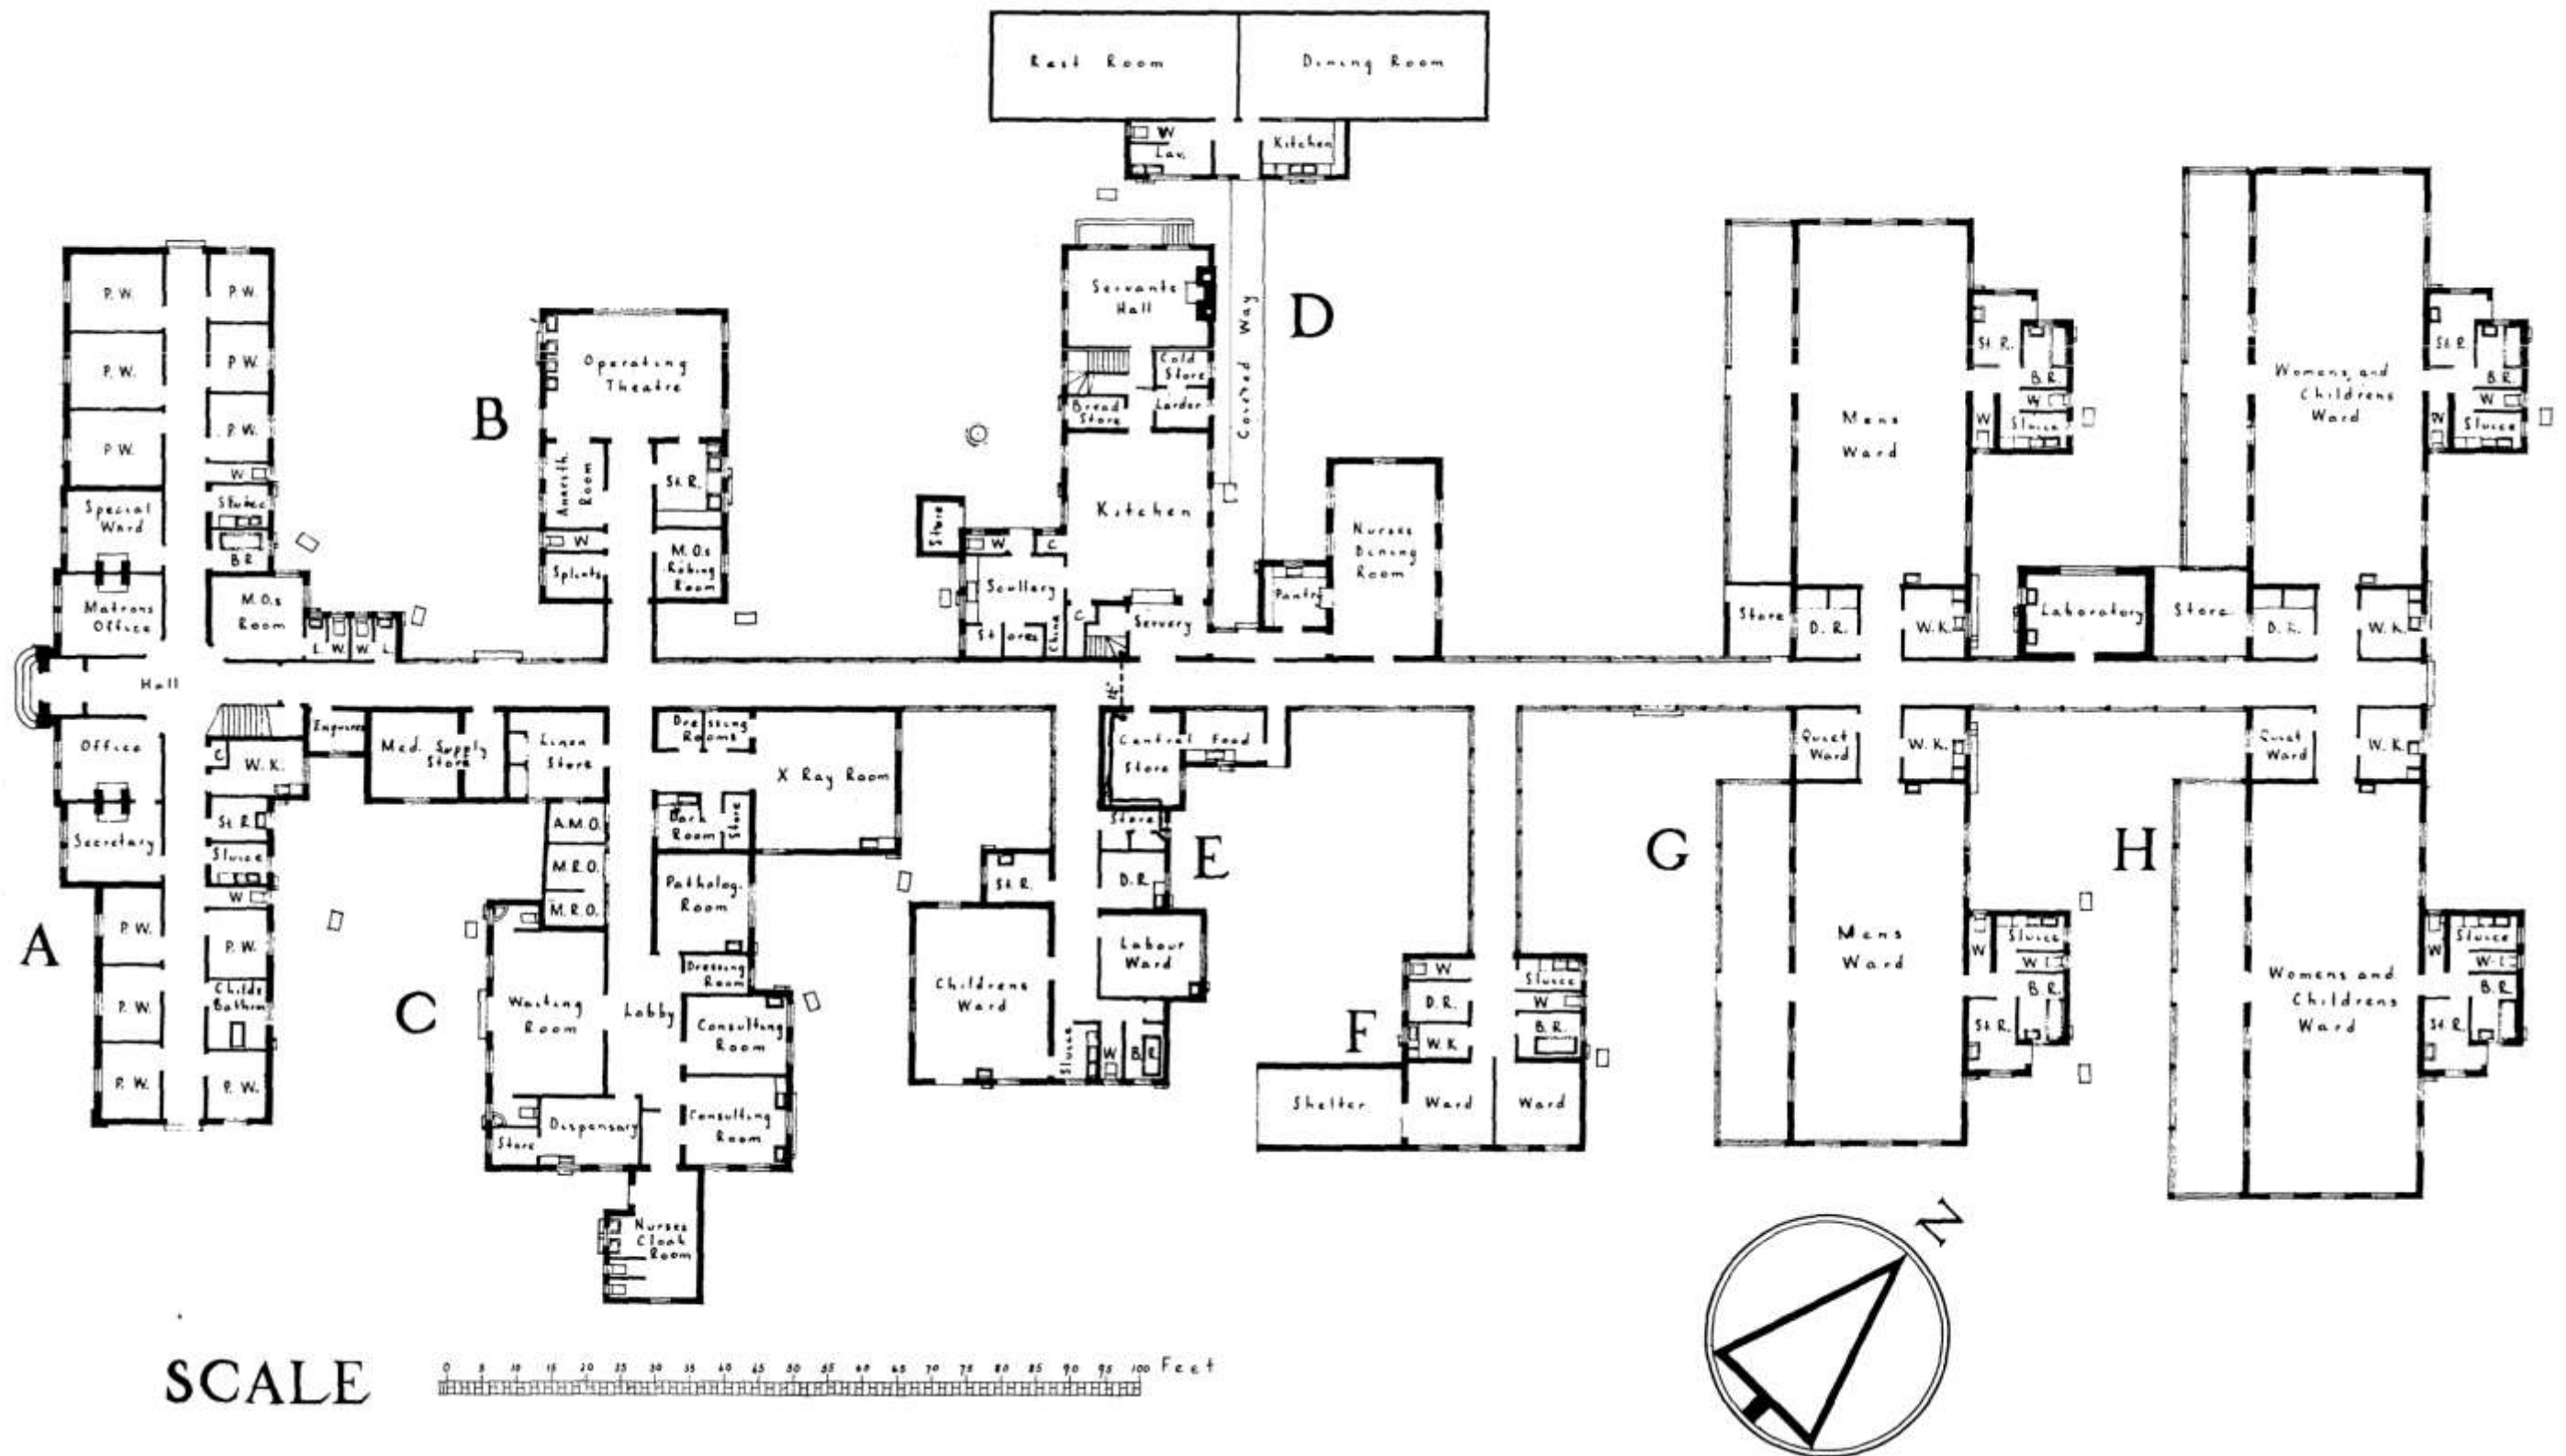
Ground floor plan of main hospital building, 1962 (scale as shown)
